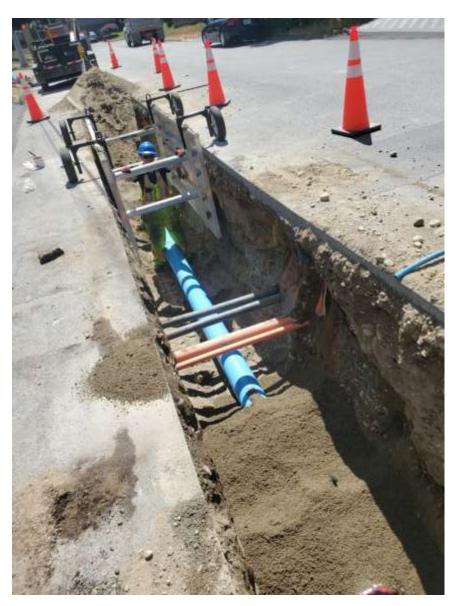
PIPE REPLACEMENT ALONG CARLA COURT - 200-MM BIONAX© PIPE WAS INSTALLED.
